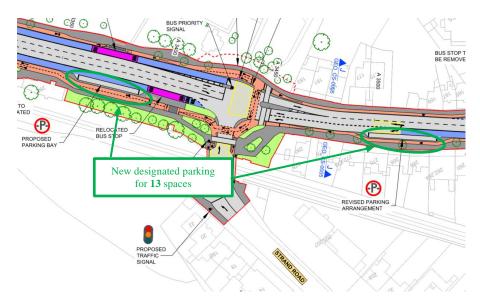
Proposed scheme design on Merrion Road (Strand Road)
